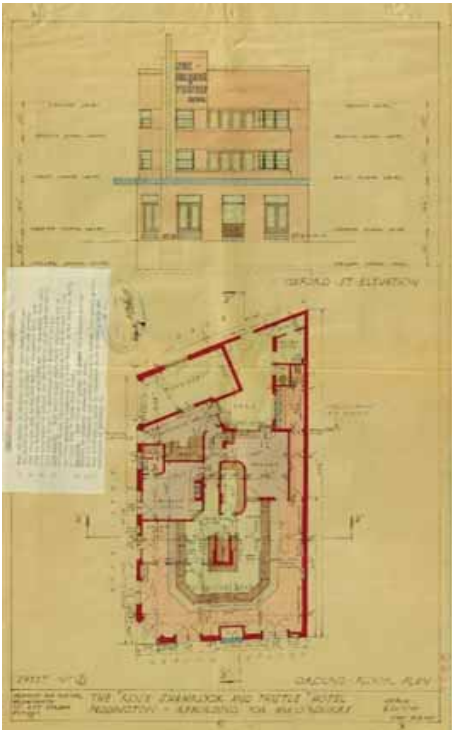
front elevation and ground floor plan for the rebuilding of the Rose Shamrock and Thistle Hotel. (Source: Paddington Building Plans, City of Sydney Archives)
